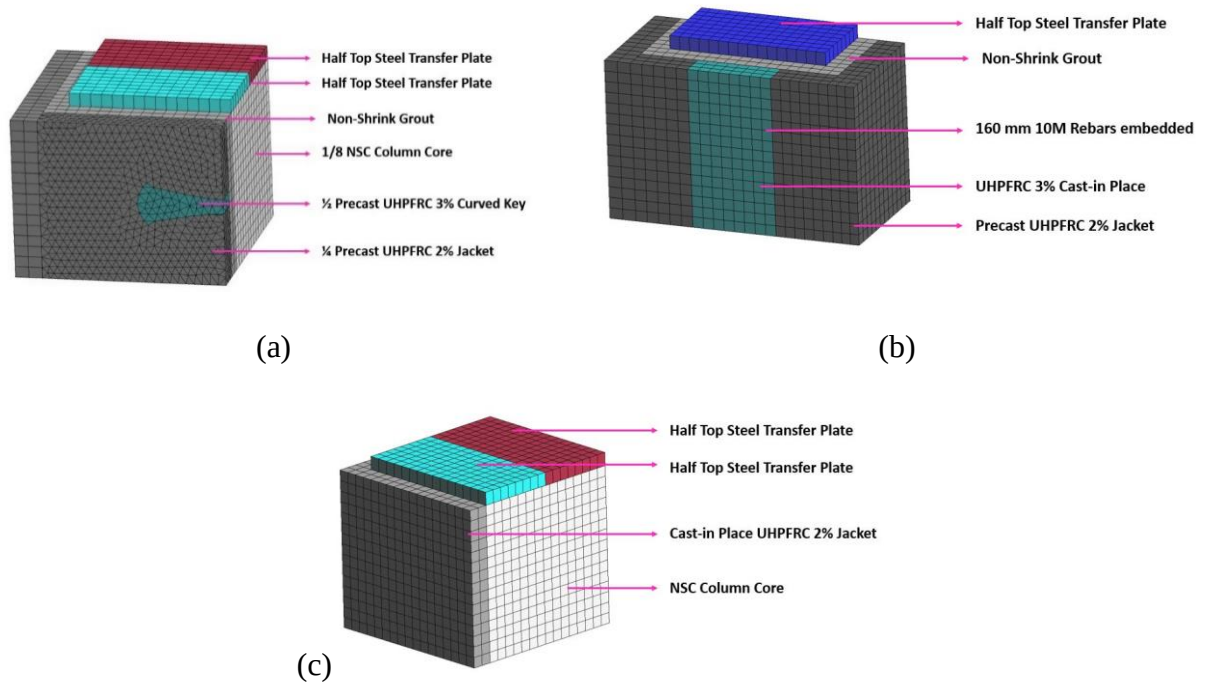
Outline of 3-D model and layer details of the Final Retrofitted Column Model (a) with the precast UHPFRC curved key, (b) with the lap splice connection and (c) cast-in place alternative.
